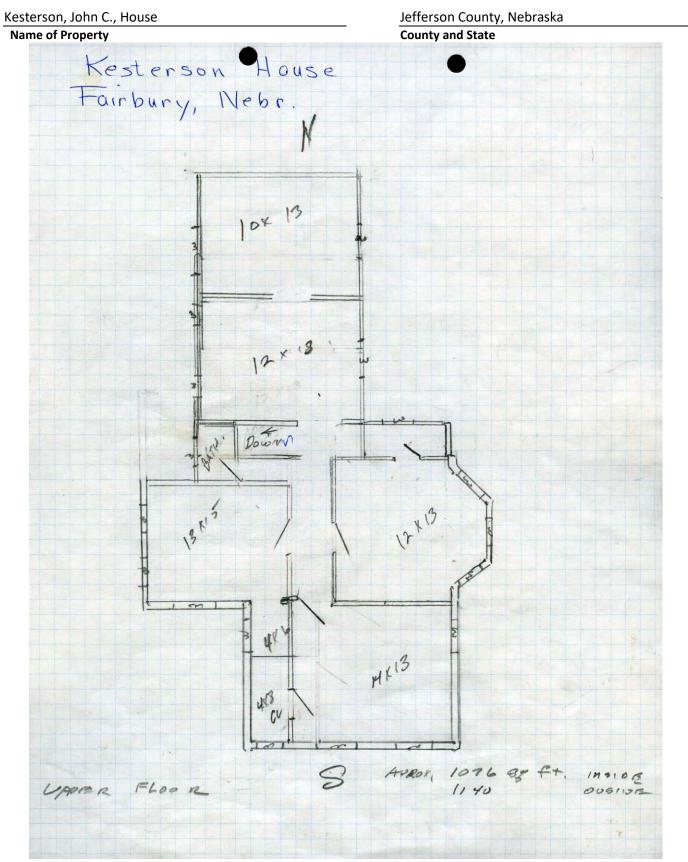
John C. Kesterson House, Floor plan, second floor, preparer unknown; this plan does not accurately represent the 1885 addition, which the northern half is not as wide as the southern half, (NeSHPO site files, JF04-045).
